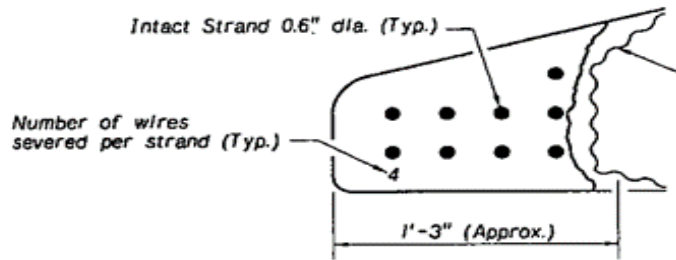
Severe I damage, one severed strand and loss of vertical camber, camber of +1 in. at undamaged girders and +0.06 in. at Girder (A), NDOT Wood River Interchange Bridge Girder (A), courtesy of NDOT
